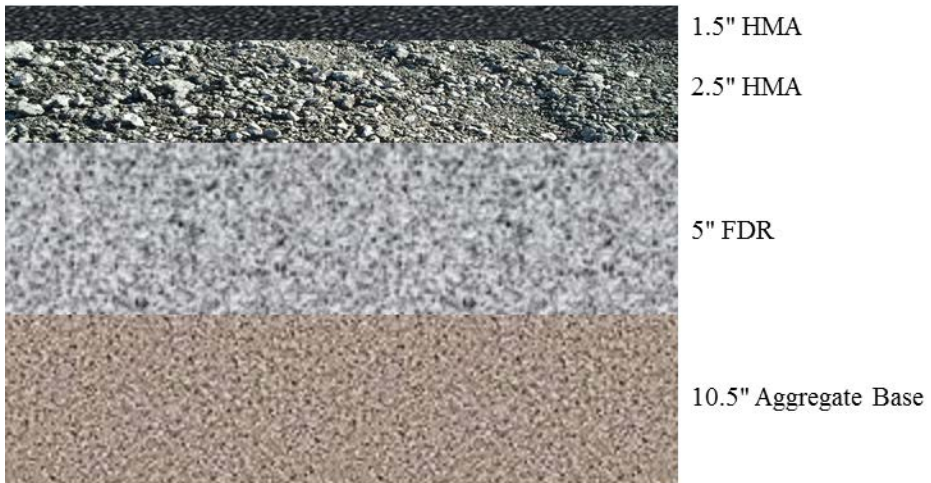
Pavement structure for Goodhue County CSAH 7 Section II
